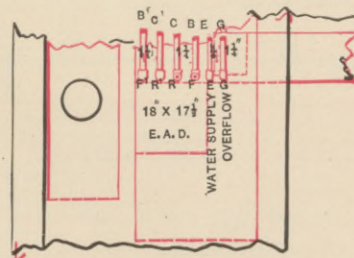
Elevation at Lower Part of Back Ventilating Shaft.
